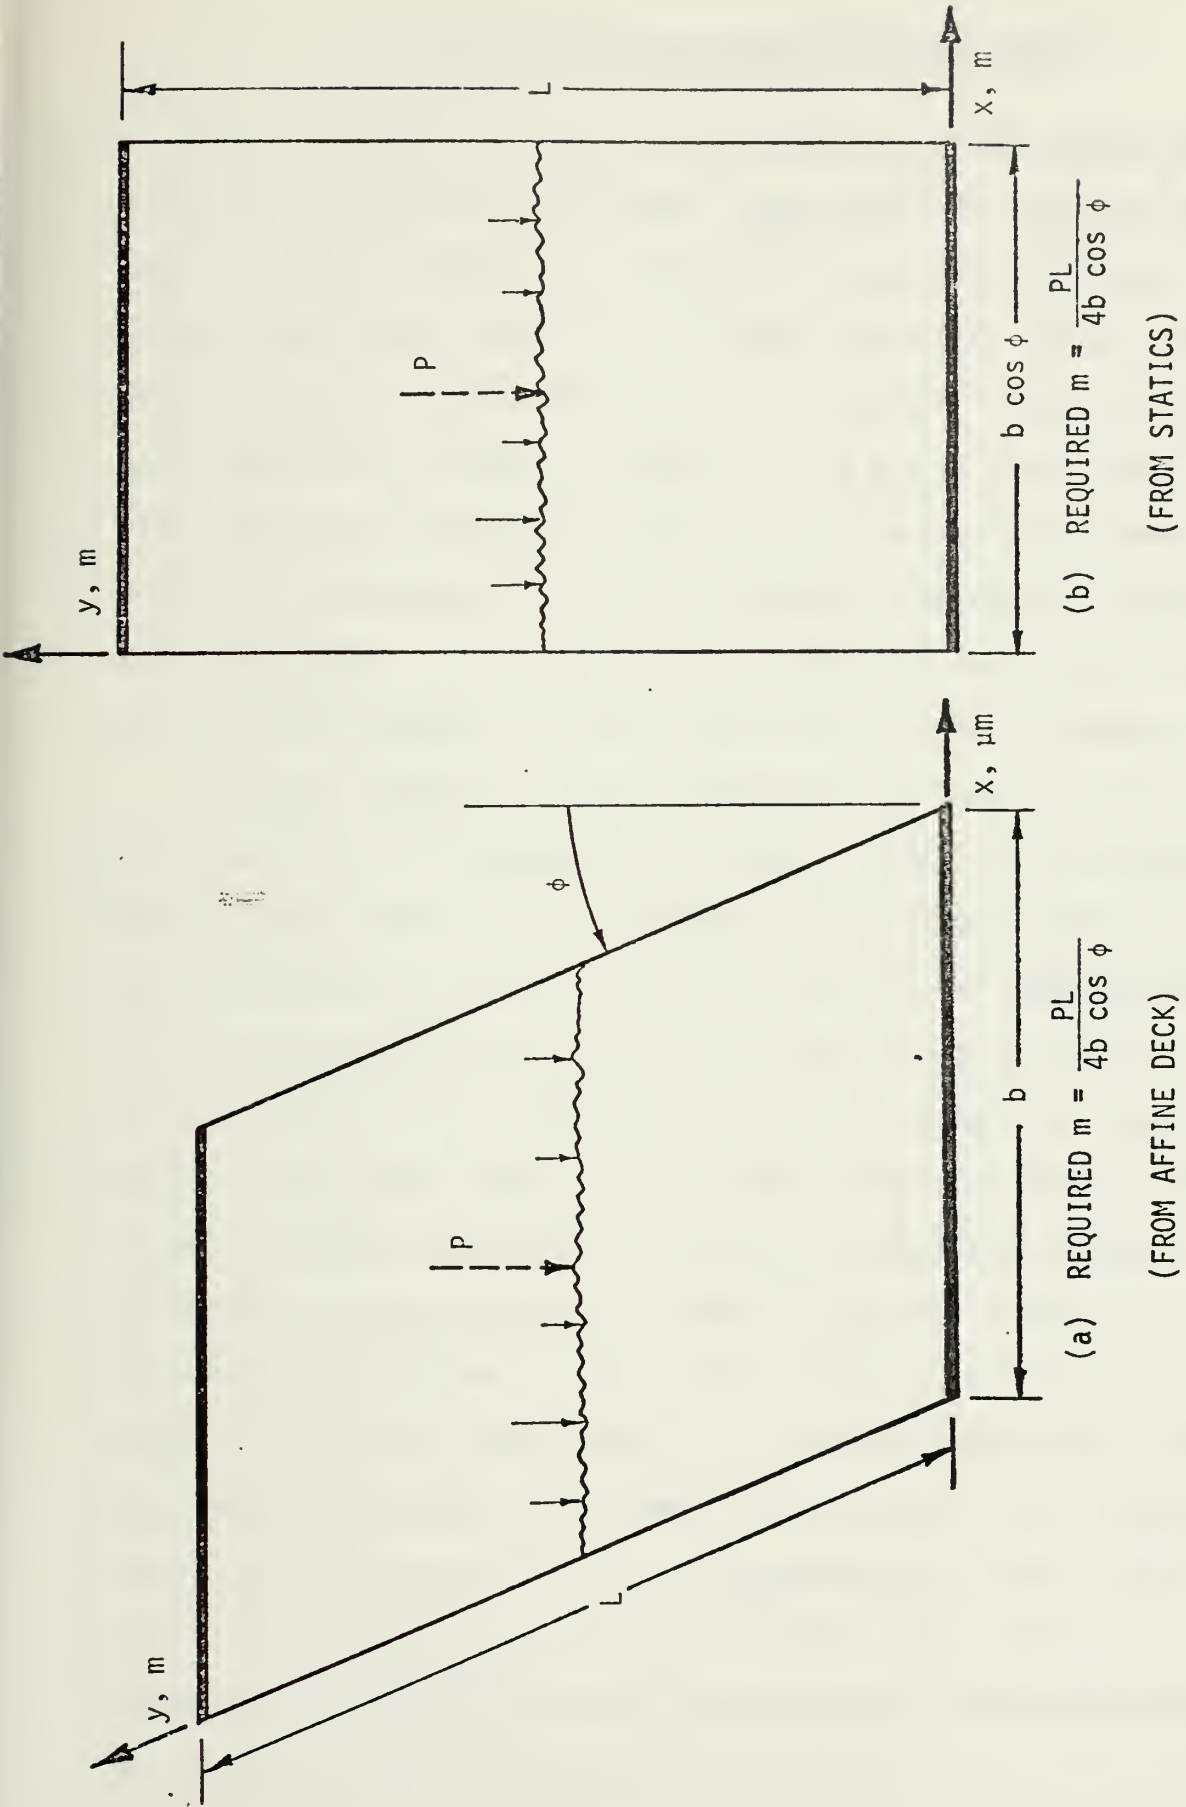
EQUIVALENT DECKS IN BEAM ACTION FAILURE
